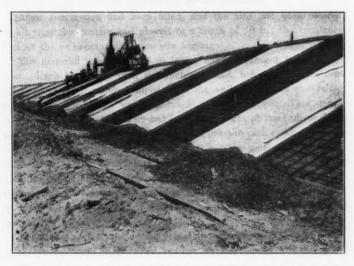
Completed Slabs, and Reinforcement Ready for Concrete for Alternate Slabs.
